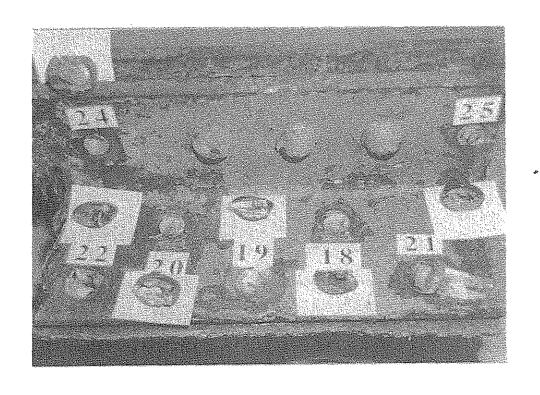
Removed Rivet Heads Next to Their Clean Holes
